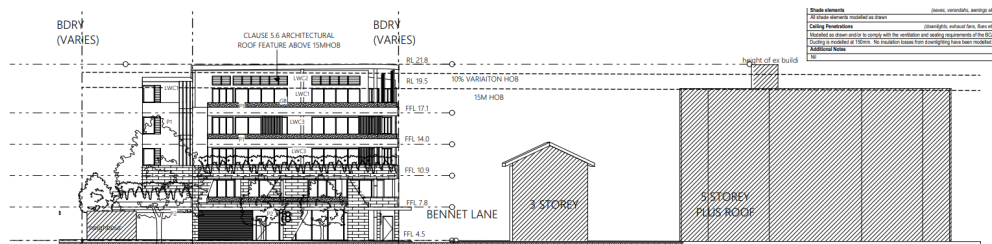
View of building along Soldiers Point Road (eastern elevation), demonstrating height consistency with the 5 storey building located north of the site.
